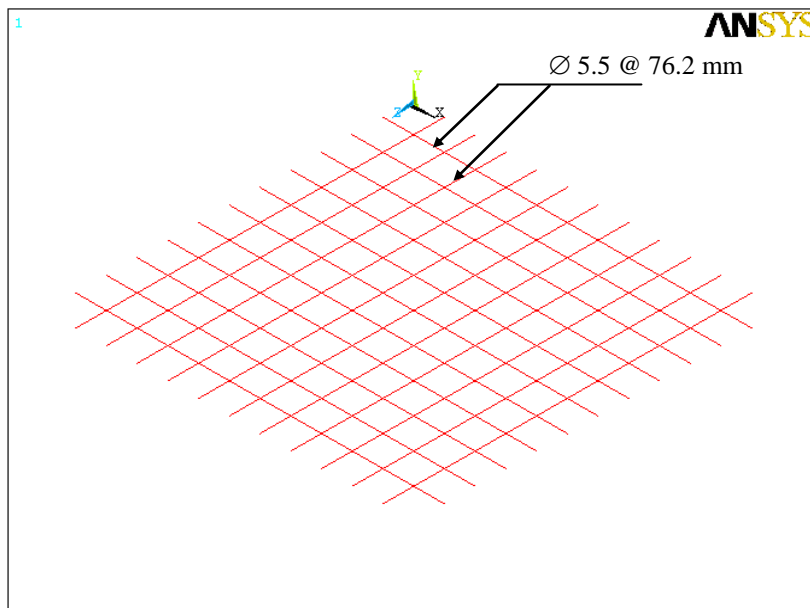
Finite element idealization of steel reinforcement for the corner – supported slab
